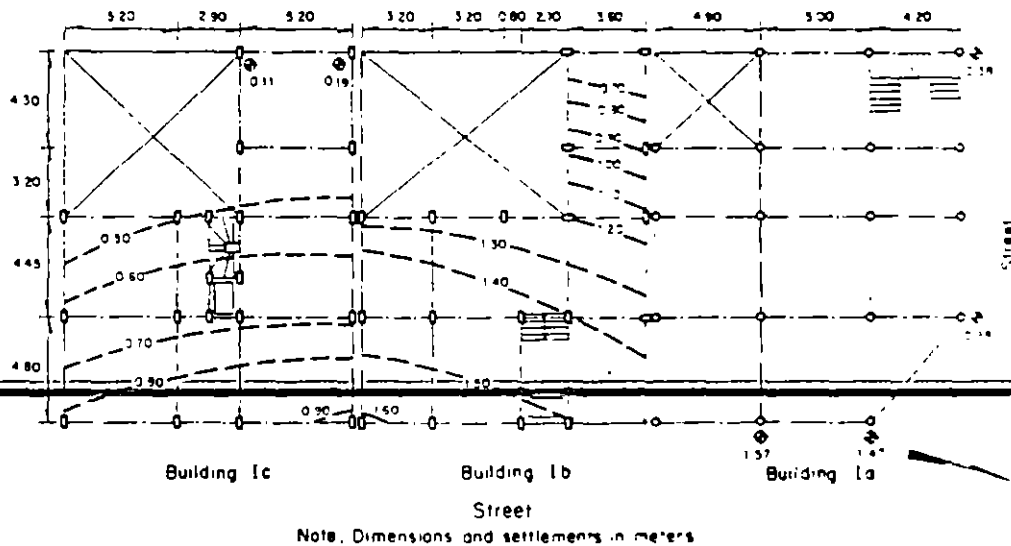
Plan and outline of settlements in three buildings on mat foundation.
